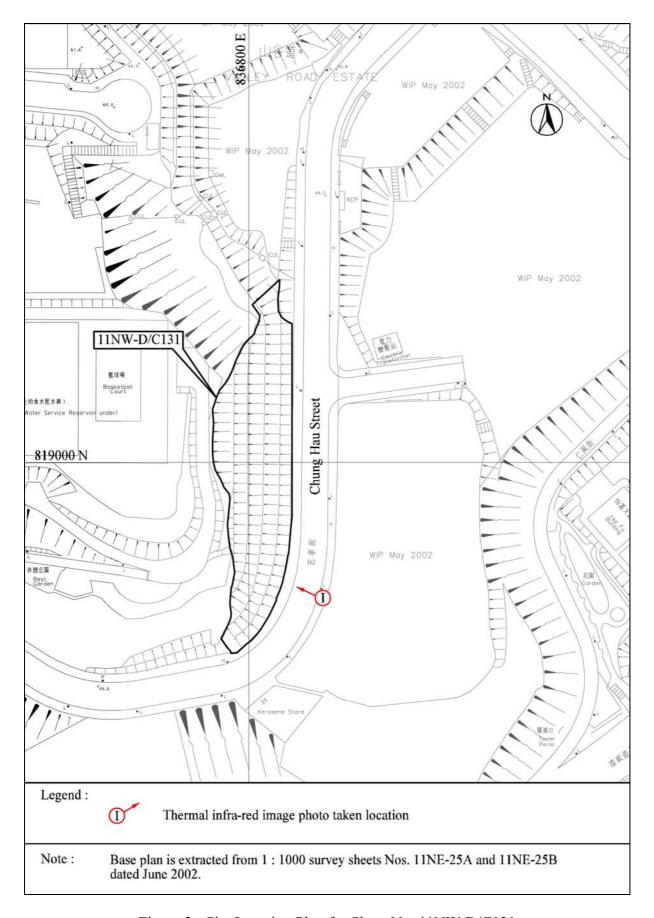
Site Location Plan for Slope No. 11NW-D/C131
